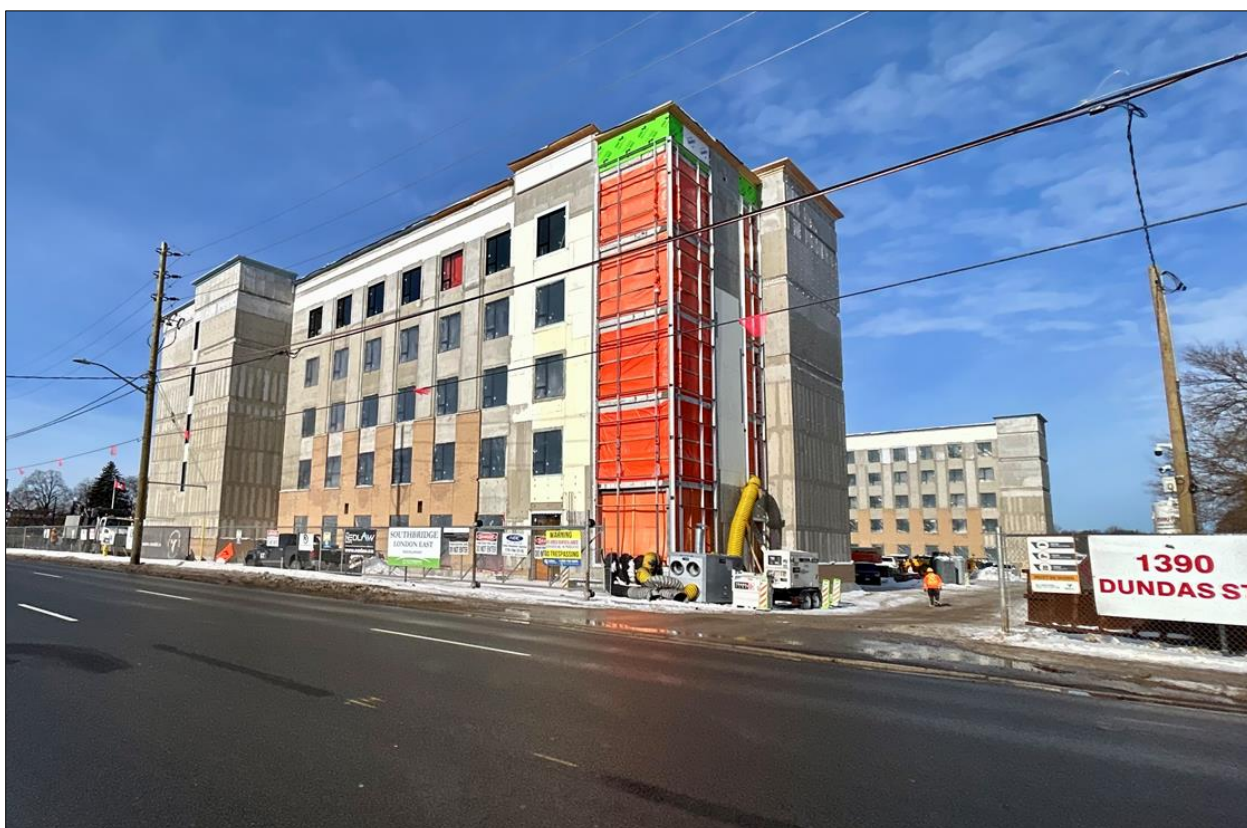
Streetview from Dundas Street (looking north – dated January 17, 2025)
